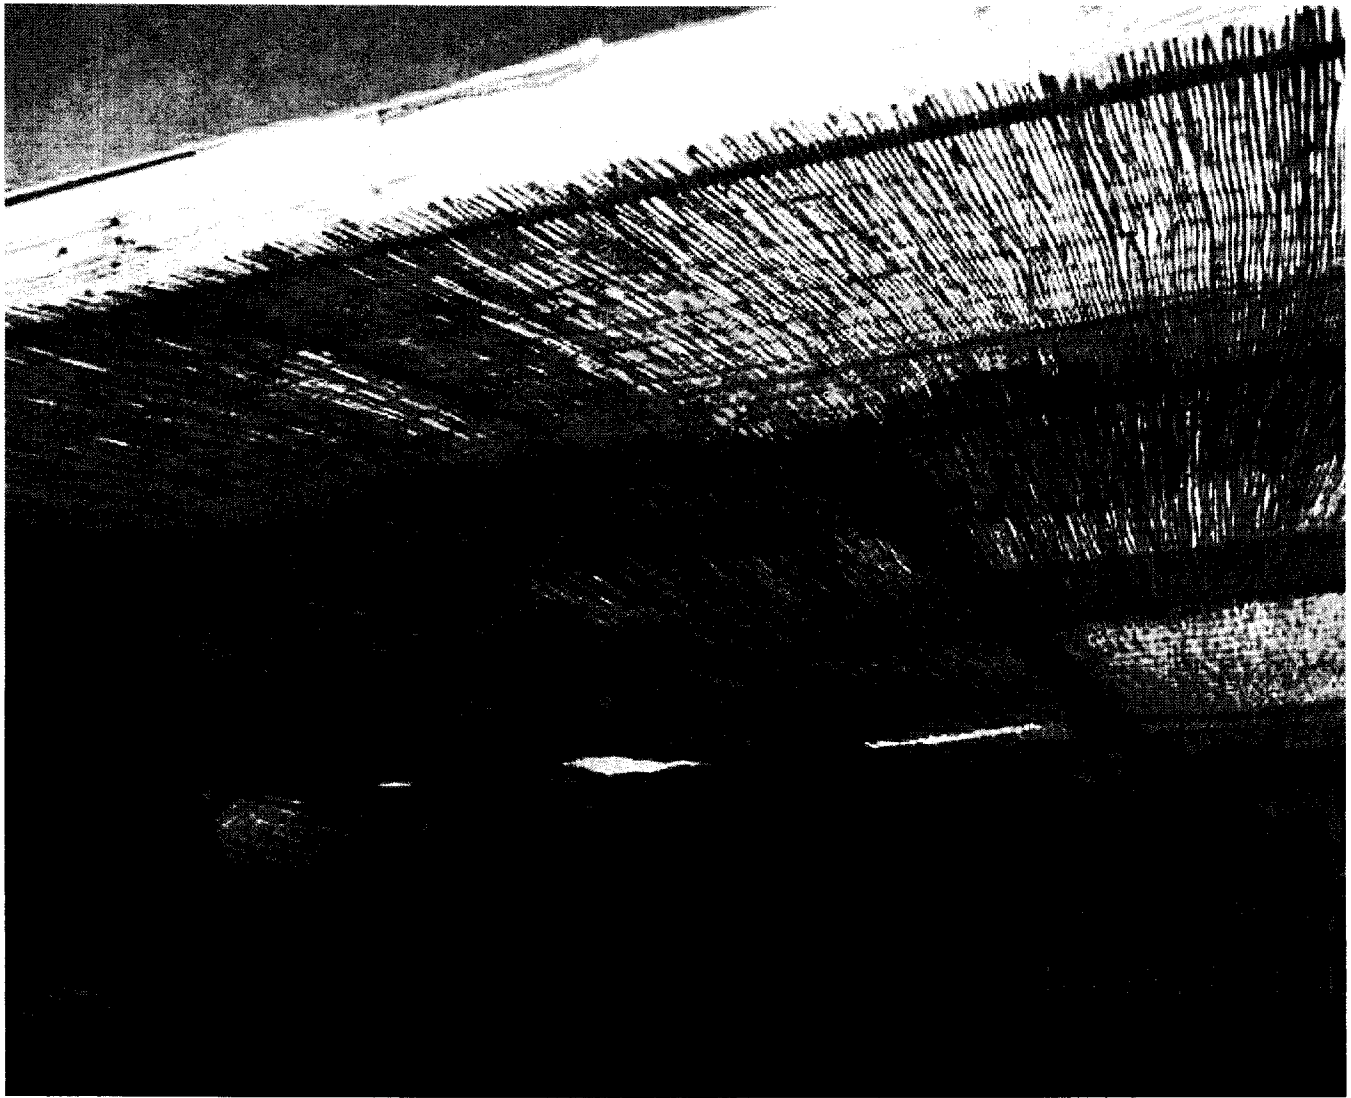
Ceiling/roof of unpermitted patio cover. - 04/30/2010
